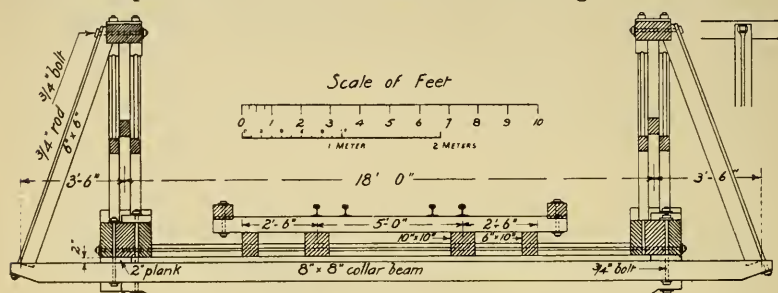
SWAY BRACING FOR PONY TRUSSES.
